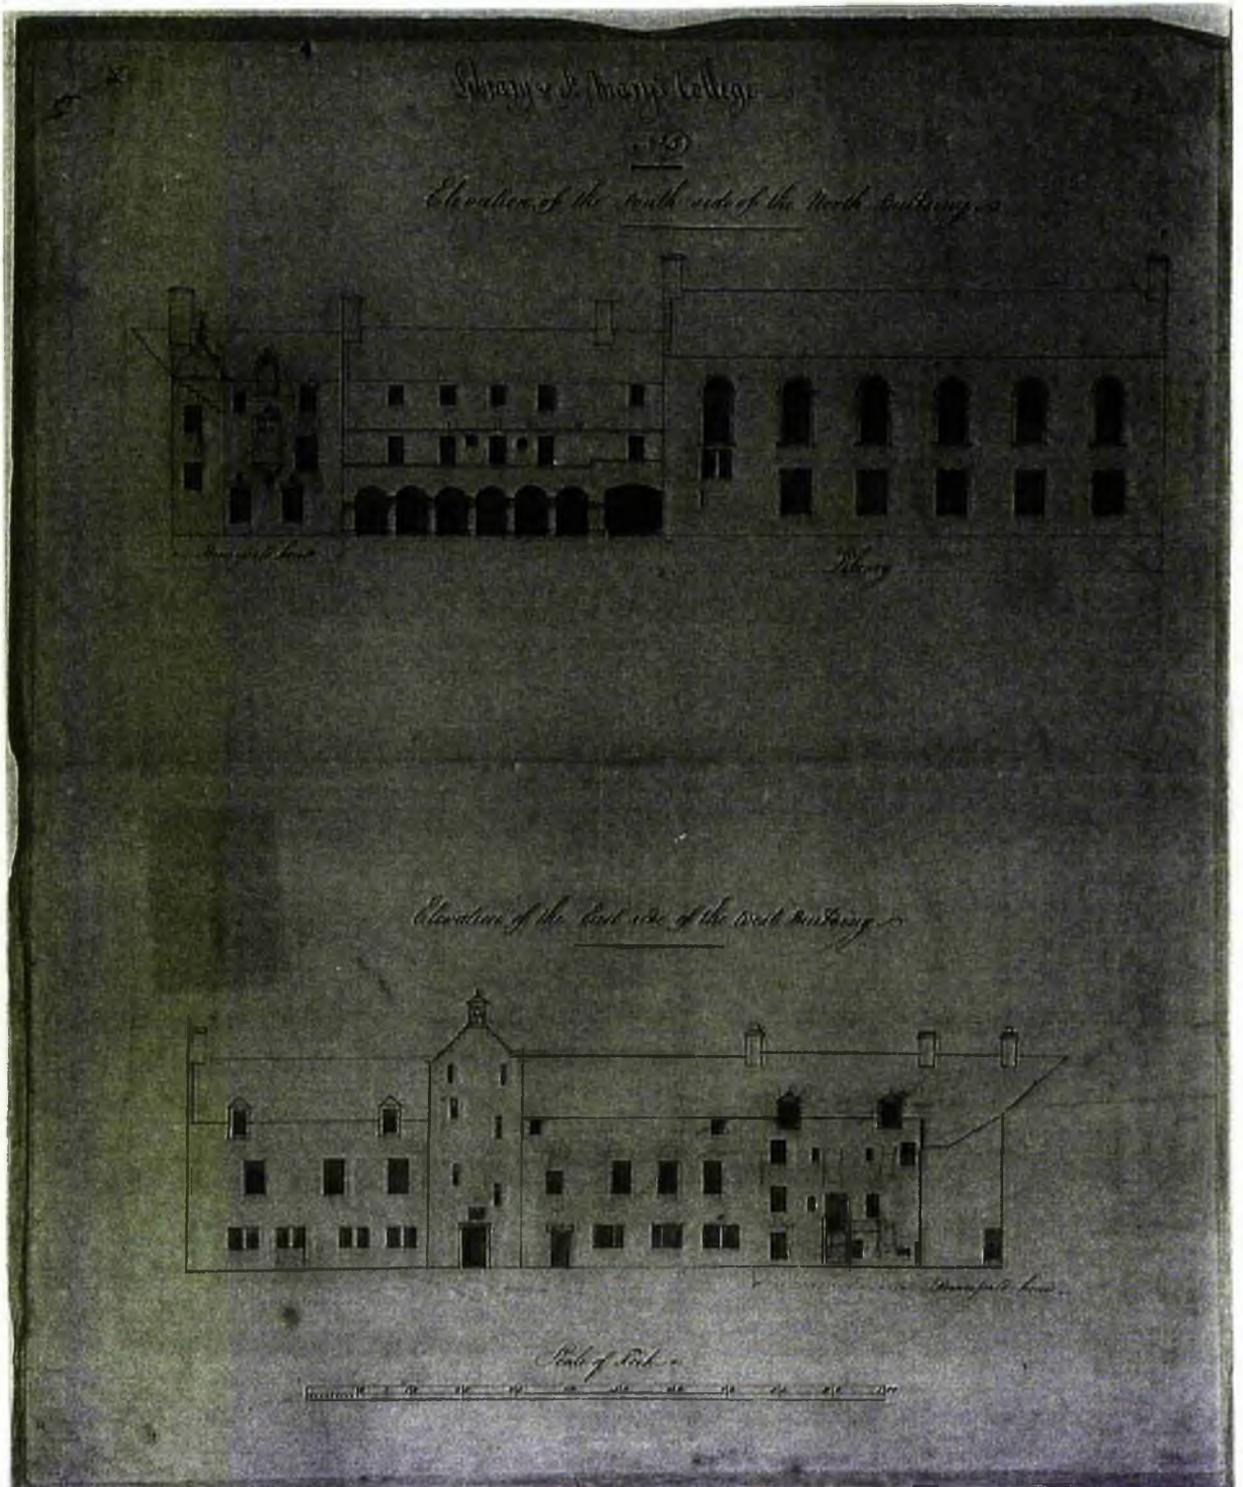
St.Mary's College. Survey drawing No.5. south elevation of north building and east elevation of west building. R. Reid, probably drawn 1825.
